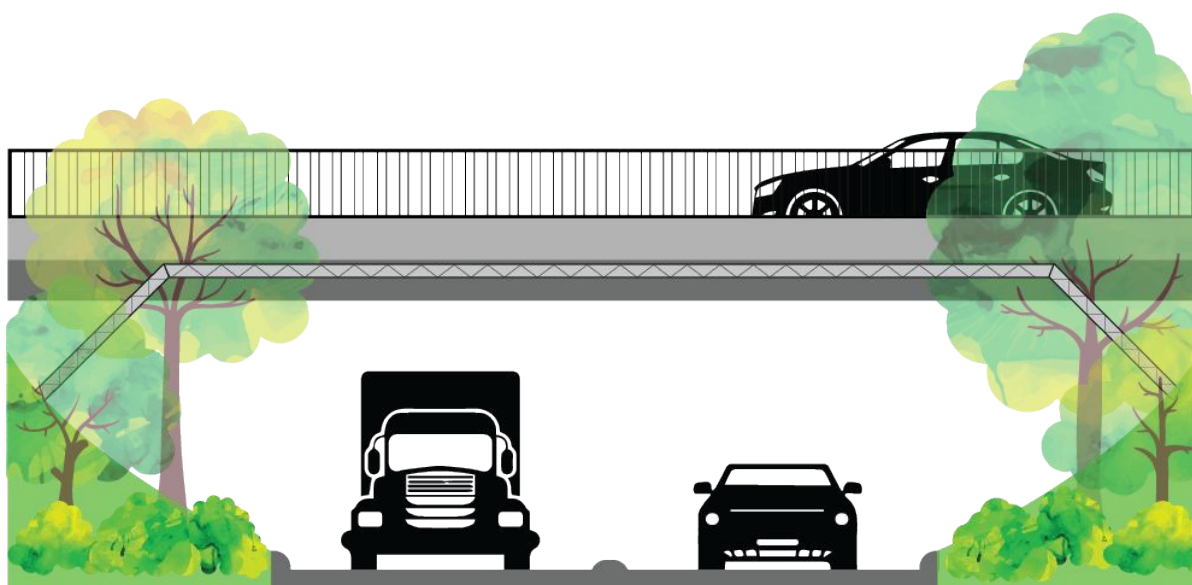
Illustration of the Animex Wildlife Bridge[®] retrofitted to the parapet of a road bridge.
